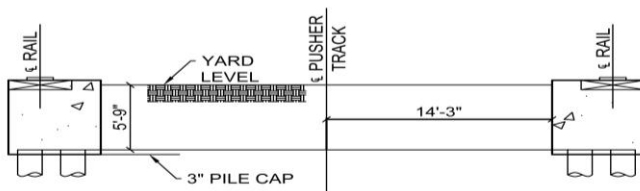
Section AA—Pile Top Elevation of Pusher Tracks
